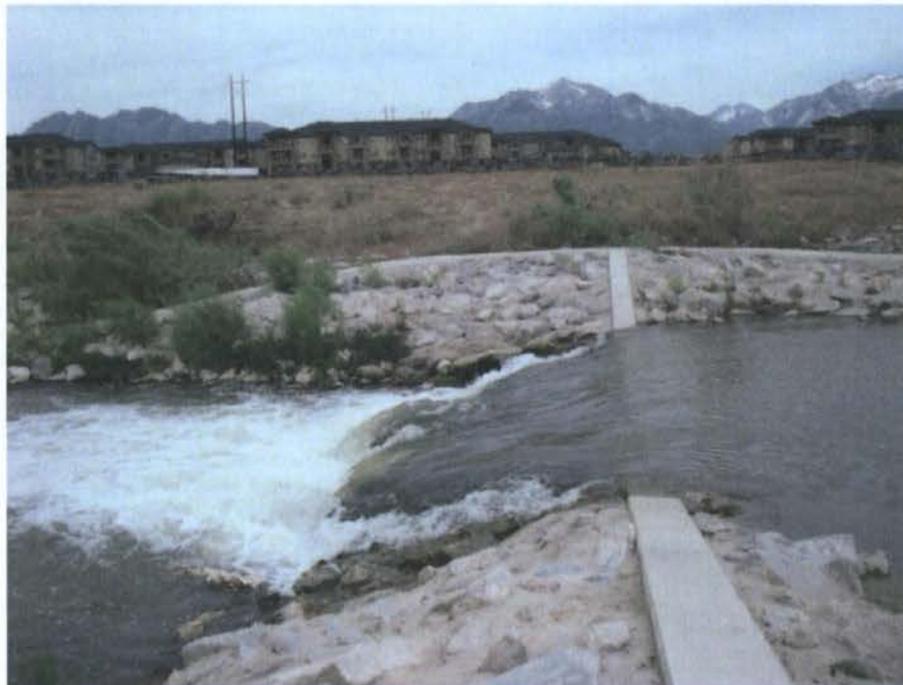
Drop Structure in Jordan River from West Jordan toward OU2.
